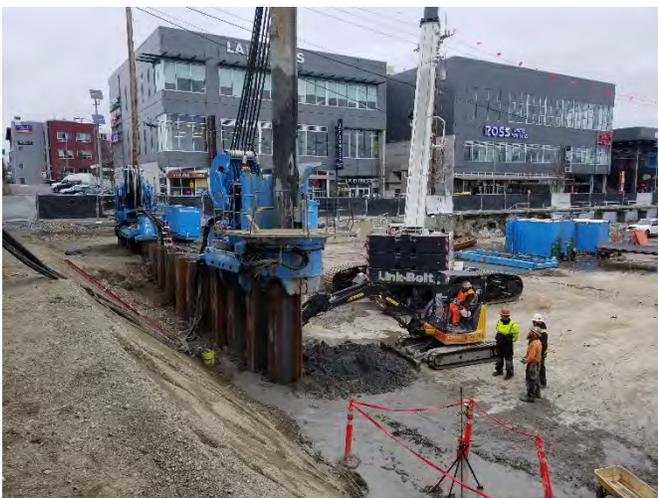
A portion of the temporary construction stormwater dewatering treatment system. 01/19/18. View facing southeast.
